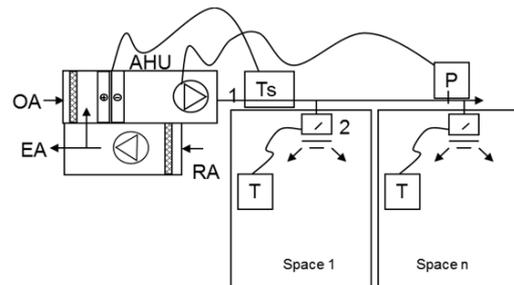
The VAV single duct system (box heaters and AHU dampers not shown)
